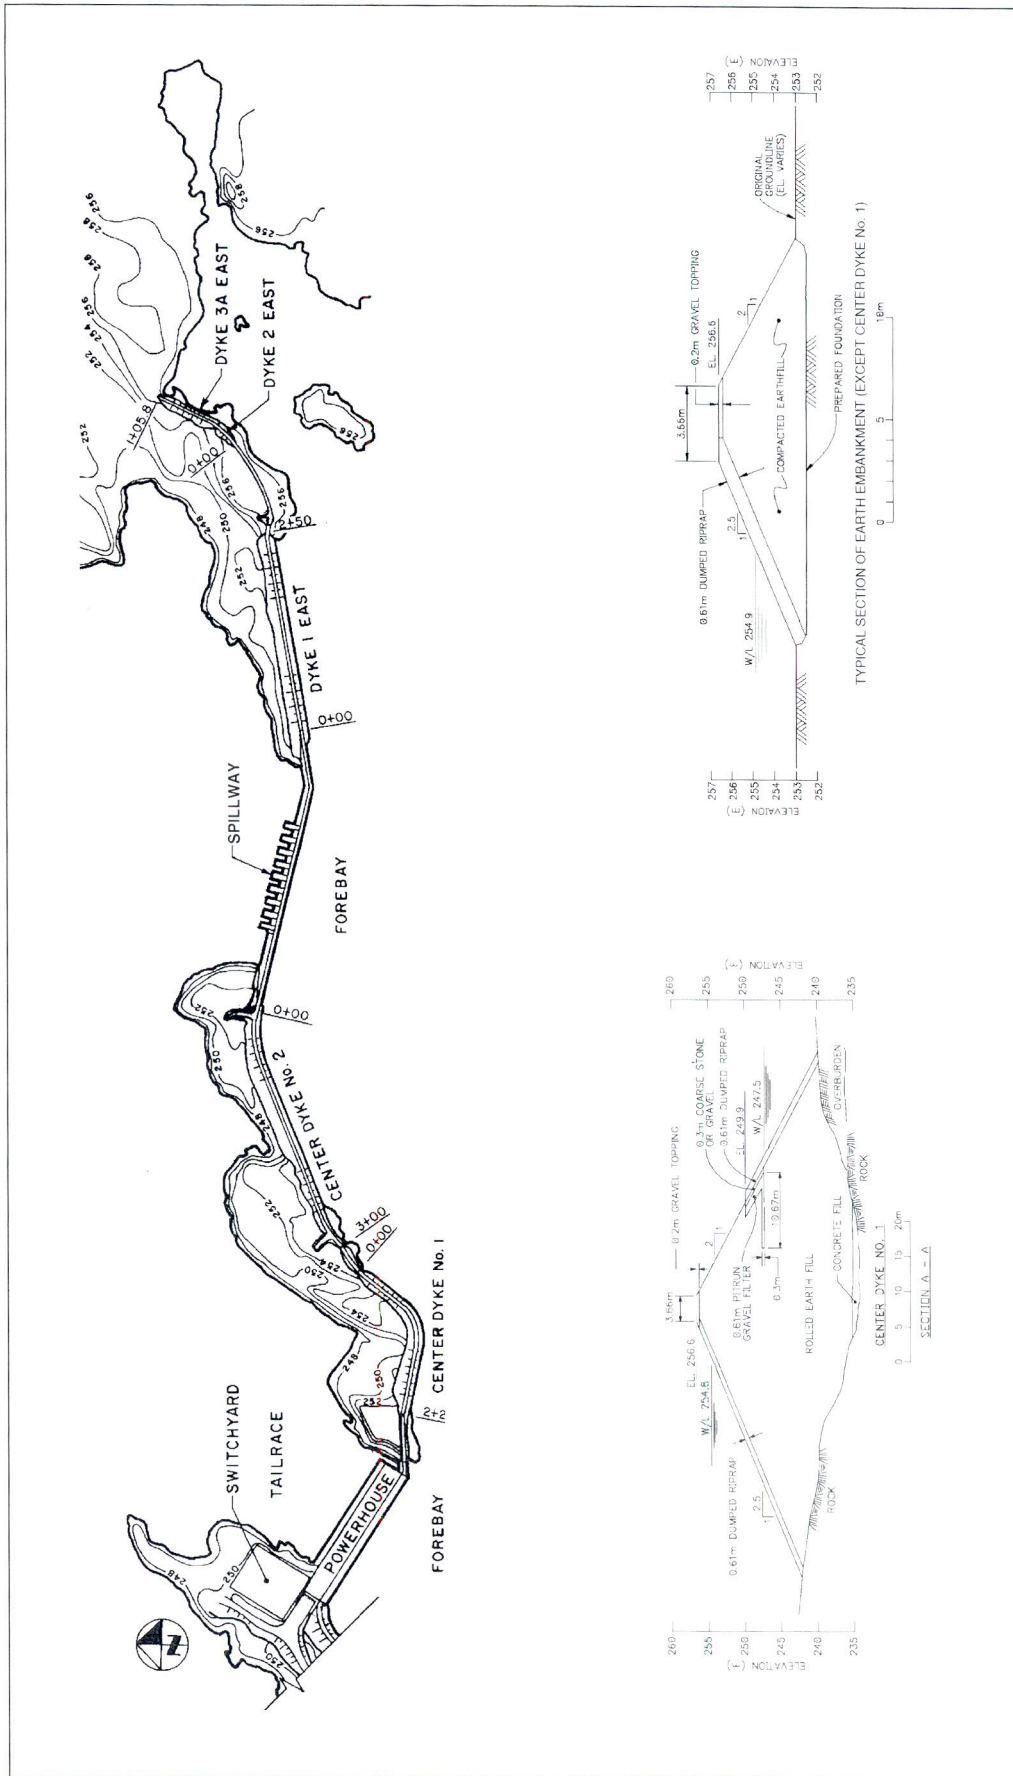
East and Center Dykes - Plan and Typical Cross Section
